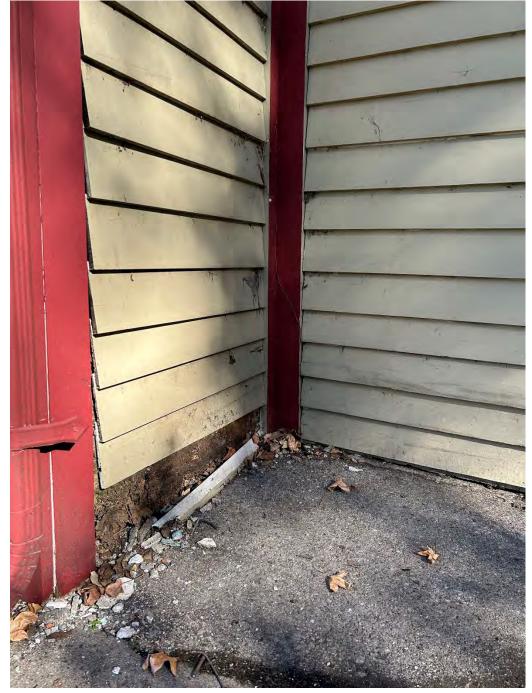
Photo of exterior damage to the addition proposed to be partially demolished.
